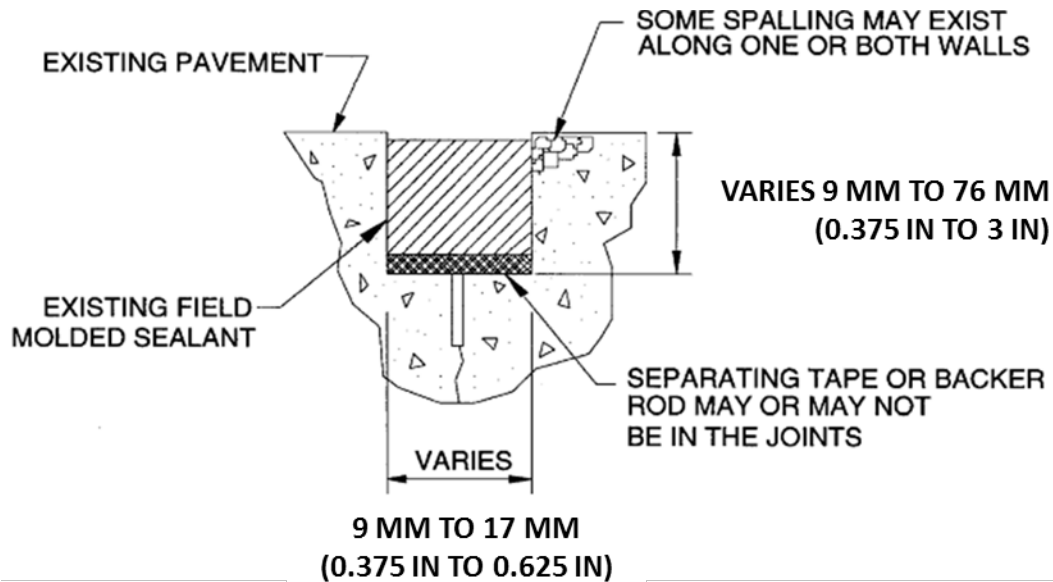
Resealed Field Molded Joint with Separating Tape
